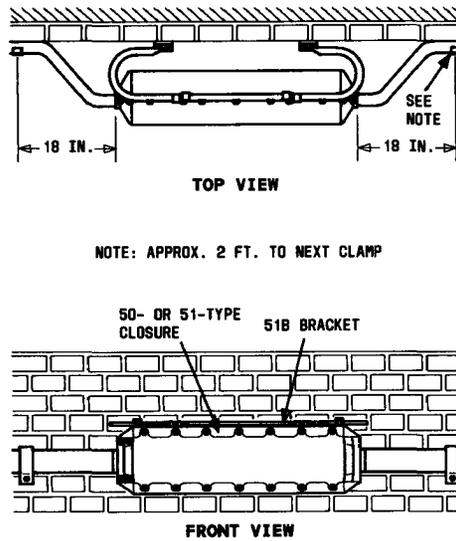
Typical Bracket and 50- or 51-Type Closure Mounting
